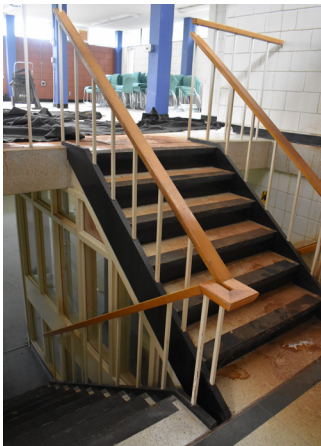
Interior of Building I and the linking volume between Buildings H and I (ERA, 2021).
